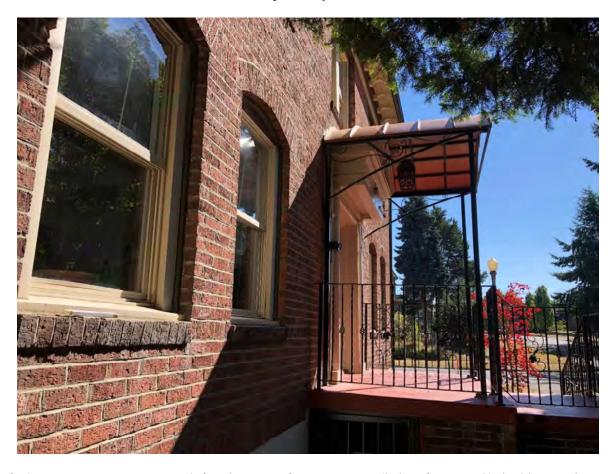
(After). Newton Apartments, north façade, egress from Basement (below front porch), looking south. August 2020. Source: Stephen Day Architecture.
